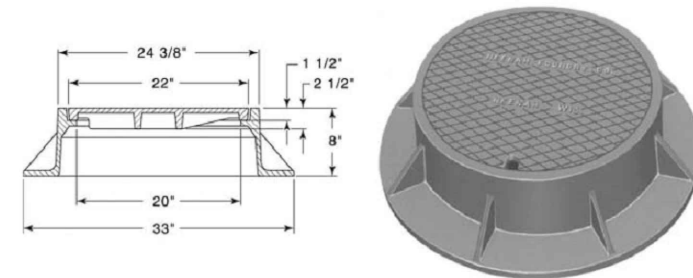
DETAIL FOR COMPUTING ROUND STRUCTURE ELEVATIONS
